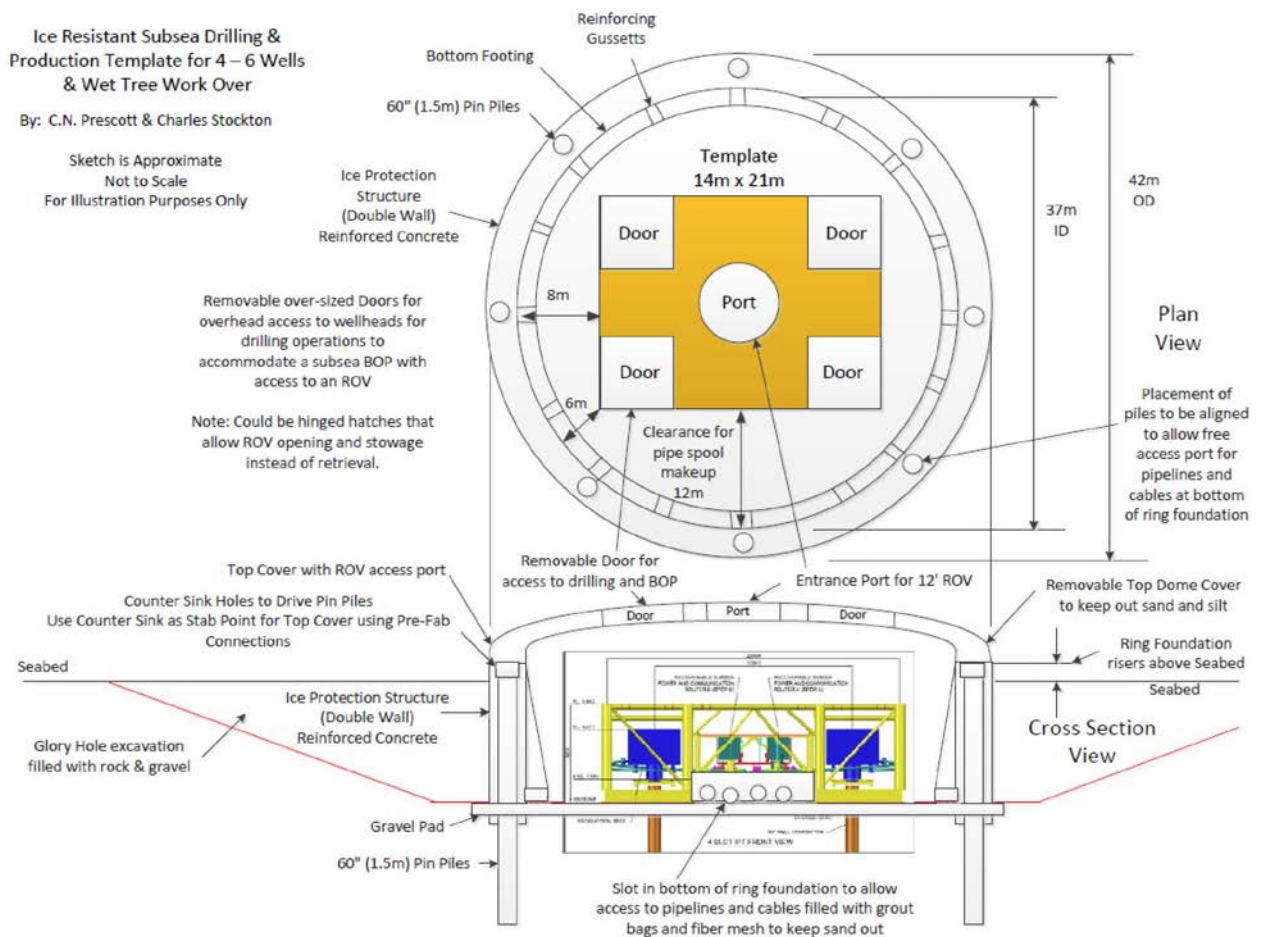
Proposed Glory Hole Protective Structure with Gravel/Rock Fill and Protective Dome with Access Ports and Doors for Drilling and Maintenance
